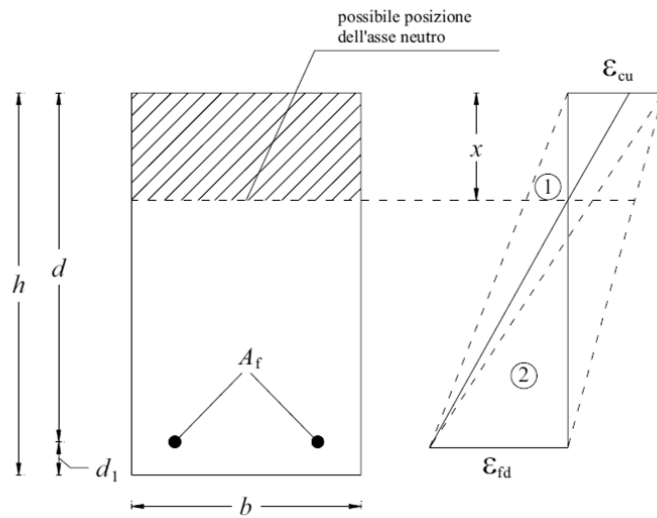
Failure modes of FRP reinforced concrete section.
